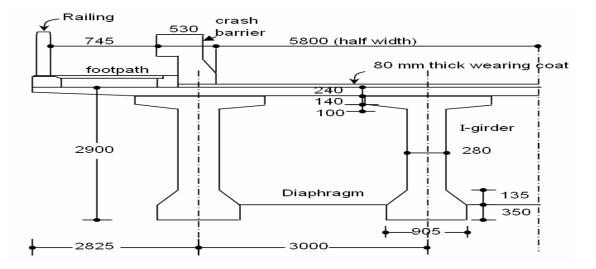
Half cross sectional view of I-type superstructure (all dimensions are in mm)
